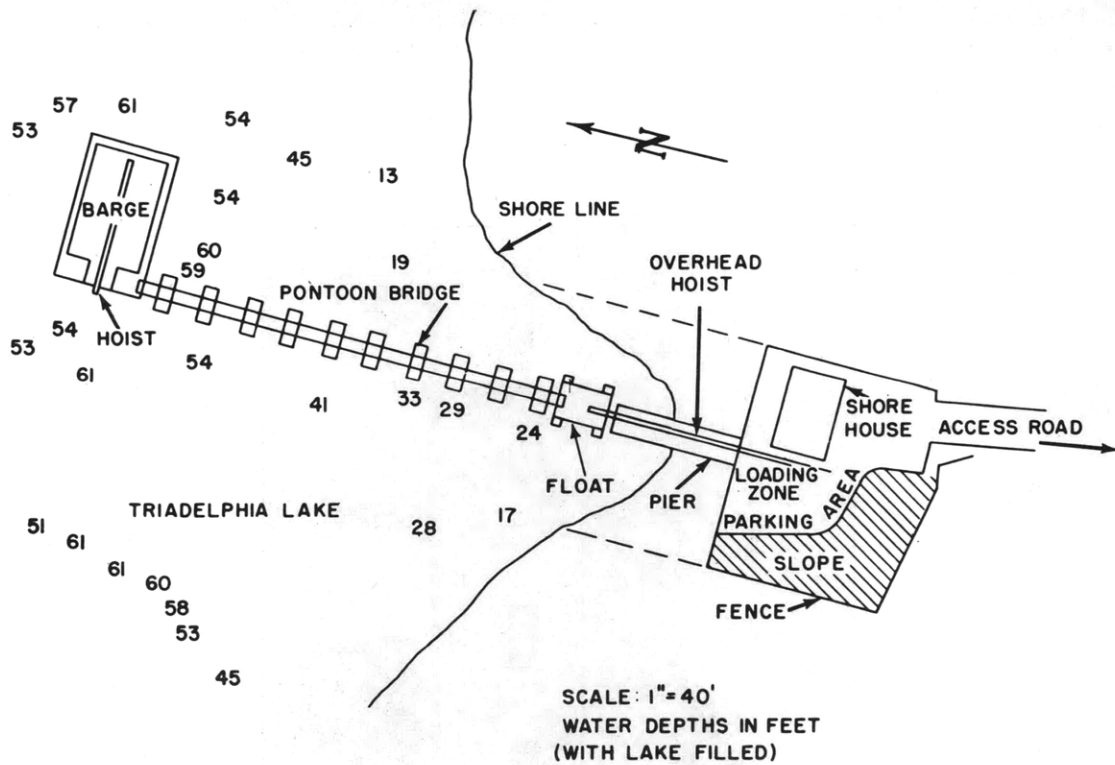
Sketch Showing General Layout at Naval Ordnance Laboratory Facility
